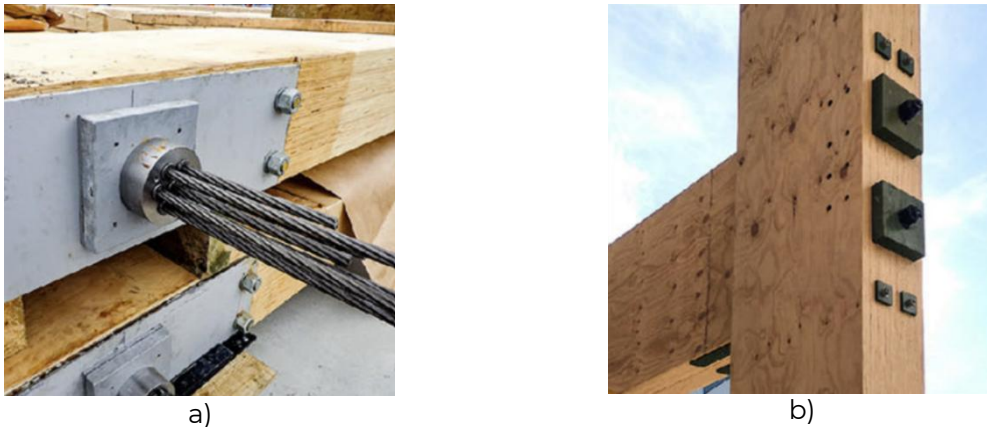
a) Post-tensioned strands coming out of the anchorages for post-tensioning in the Young Hunter House building; b) Couple of post-tensioning bars with steel plates anchorage in the Beatrice Tinsley building (Miliziano et al., 2020).
